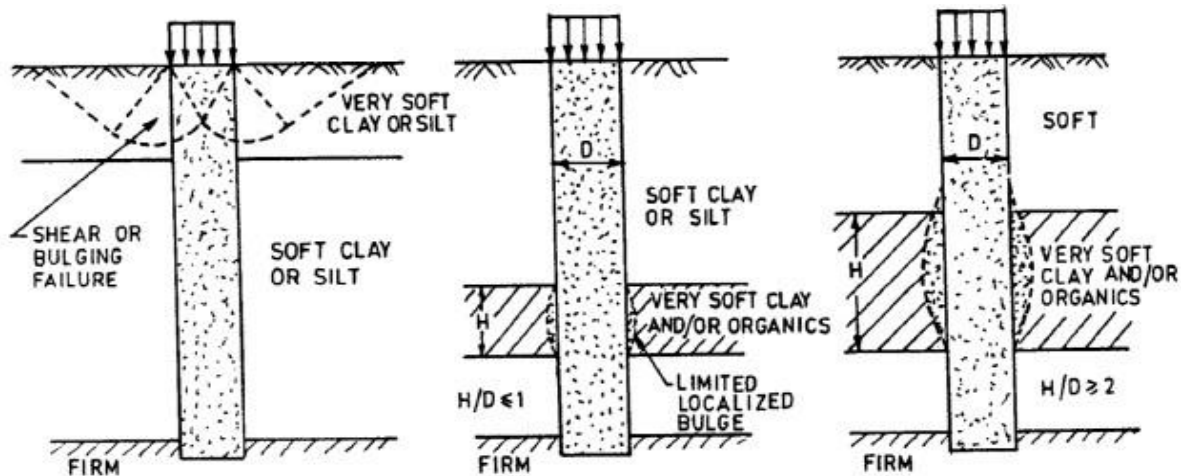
Failure mechanism of single stone column in a homogenous soft layer
